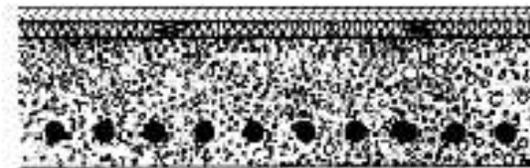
WALL AND PARTITION CONSTRUCTION, NOISE CONTROL
